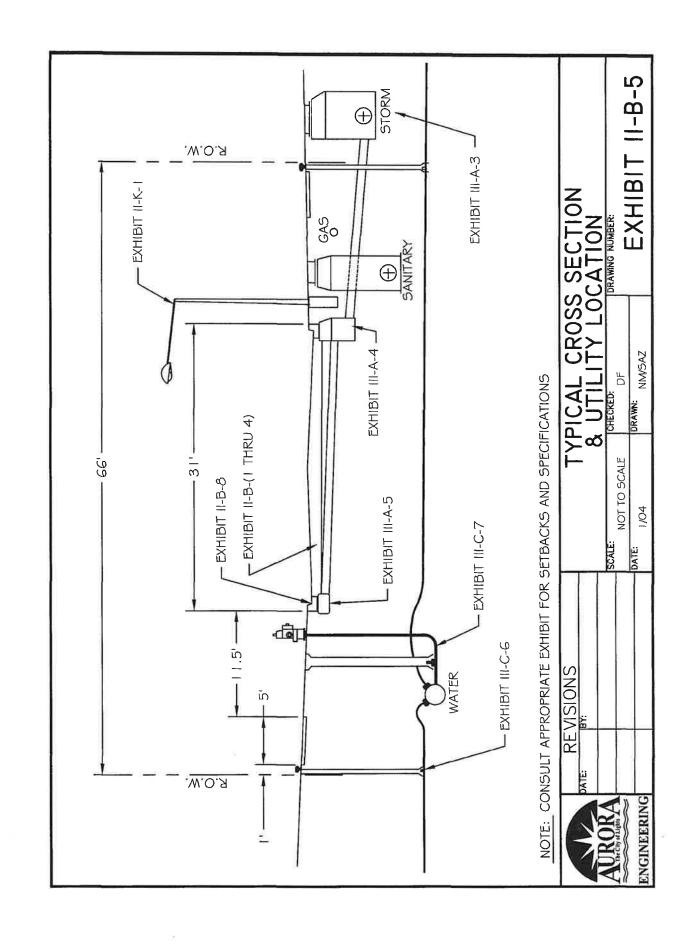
EXHIBIT "L" TYPICAL PRIVATE STREET CROSS SECTION
